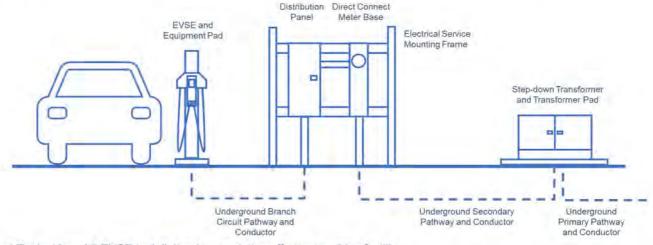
Typical Level 2 EVSE installation in an existing off-street parking facility
